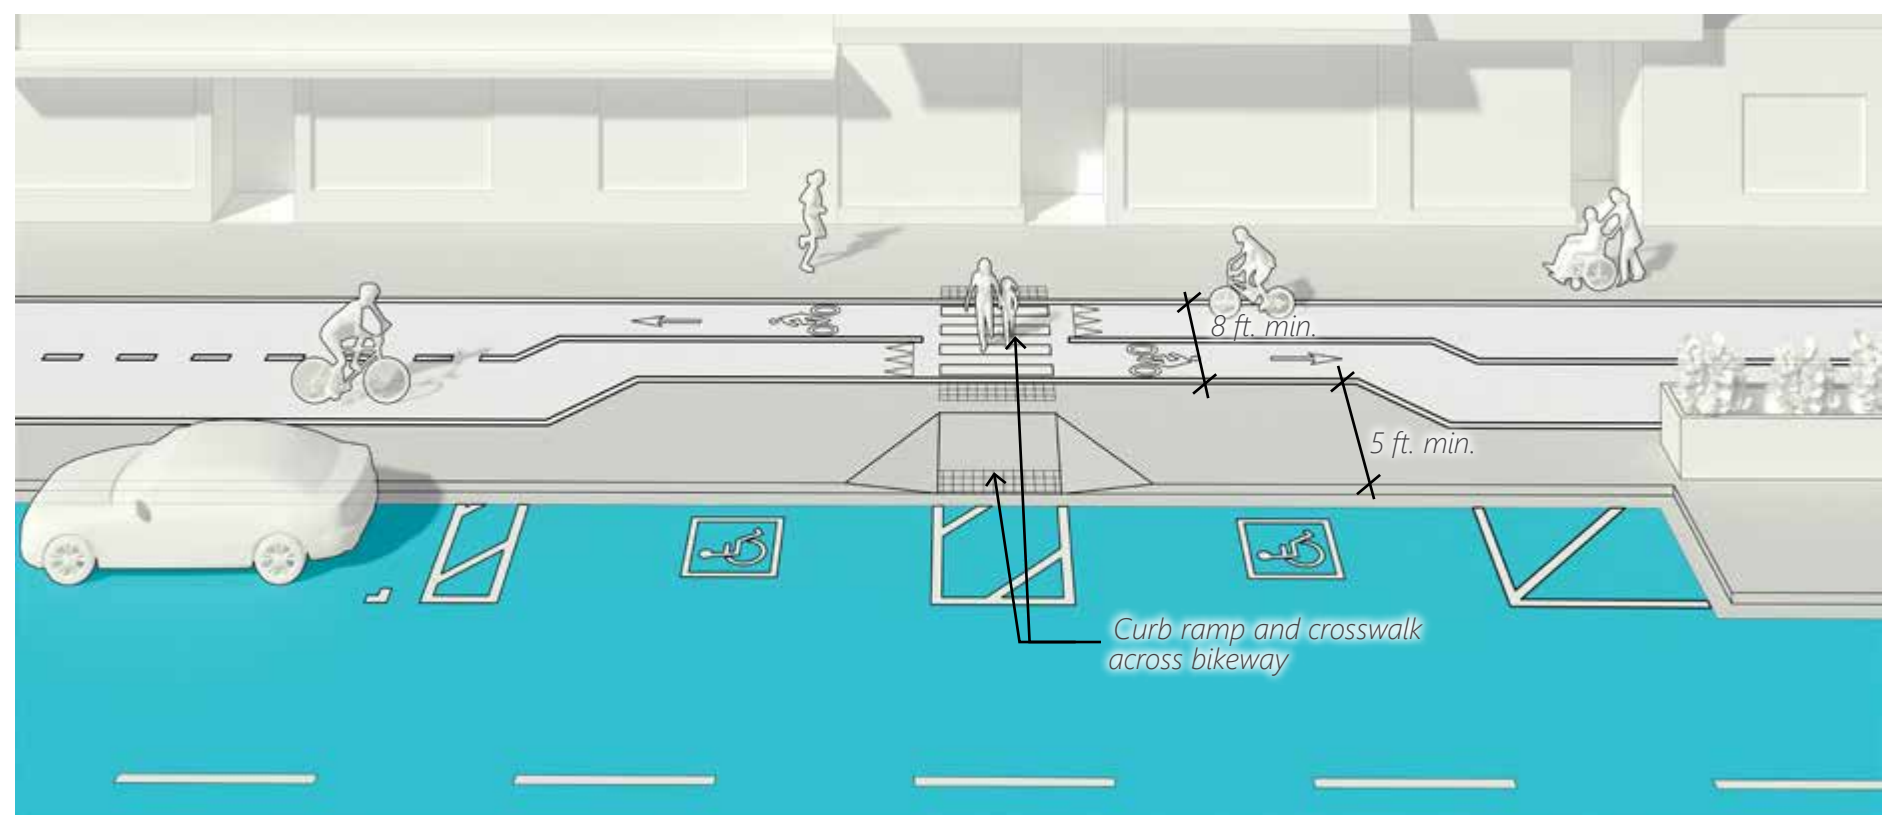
Two-Way, Sidewalk-Level, Class IV Bikeway at Accessible On-Street Parking.
